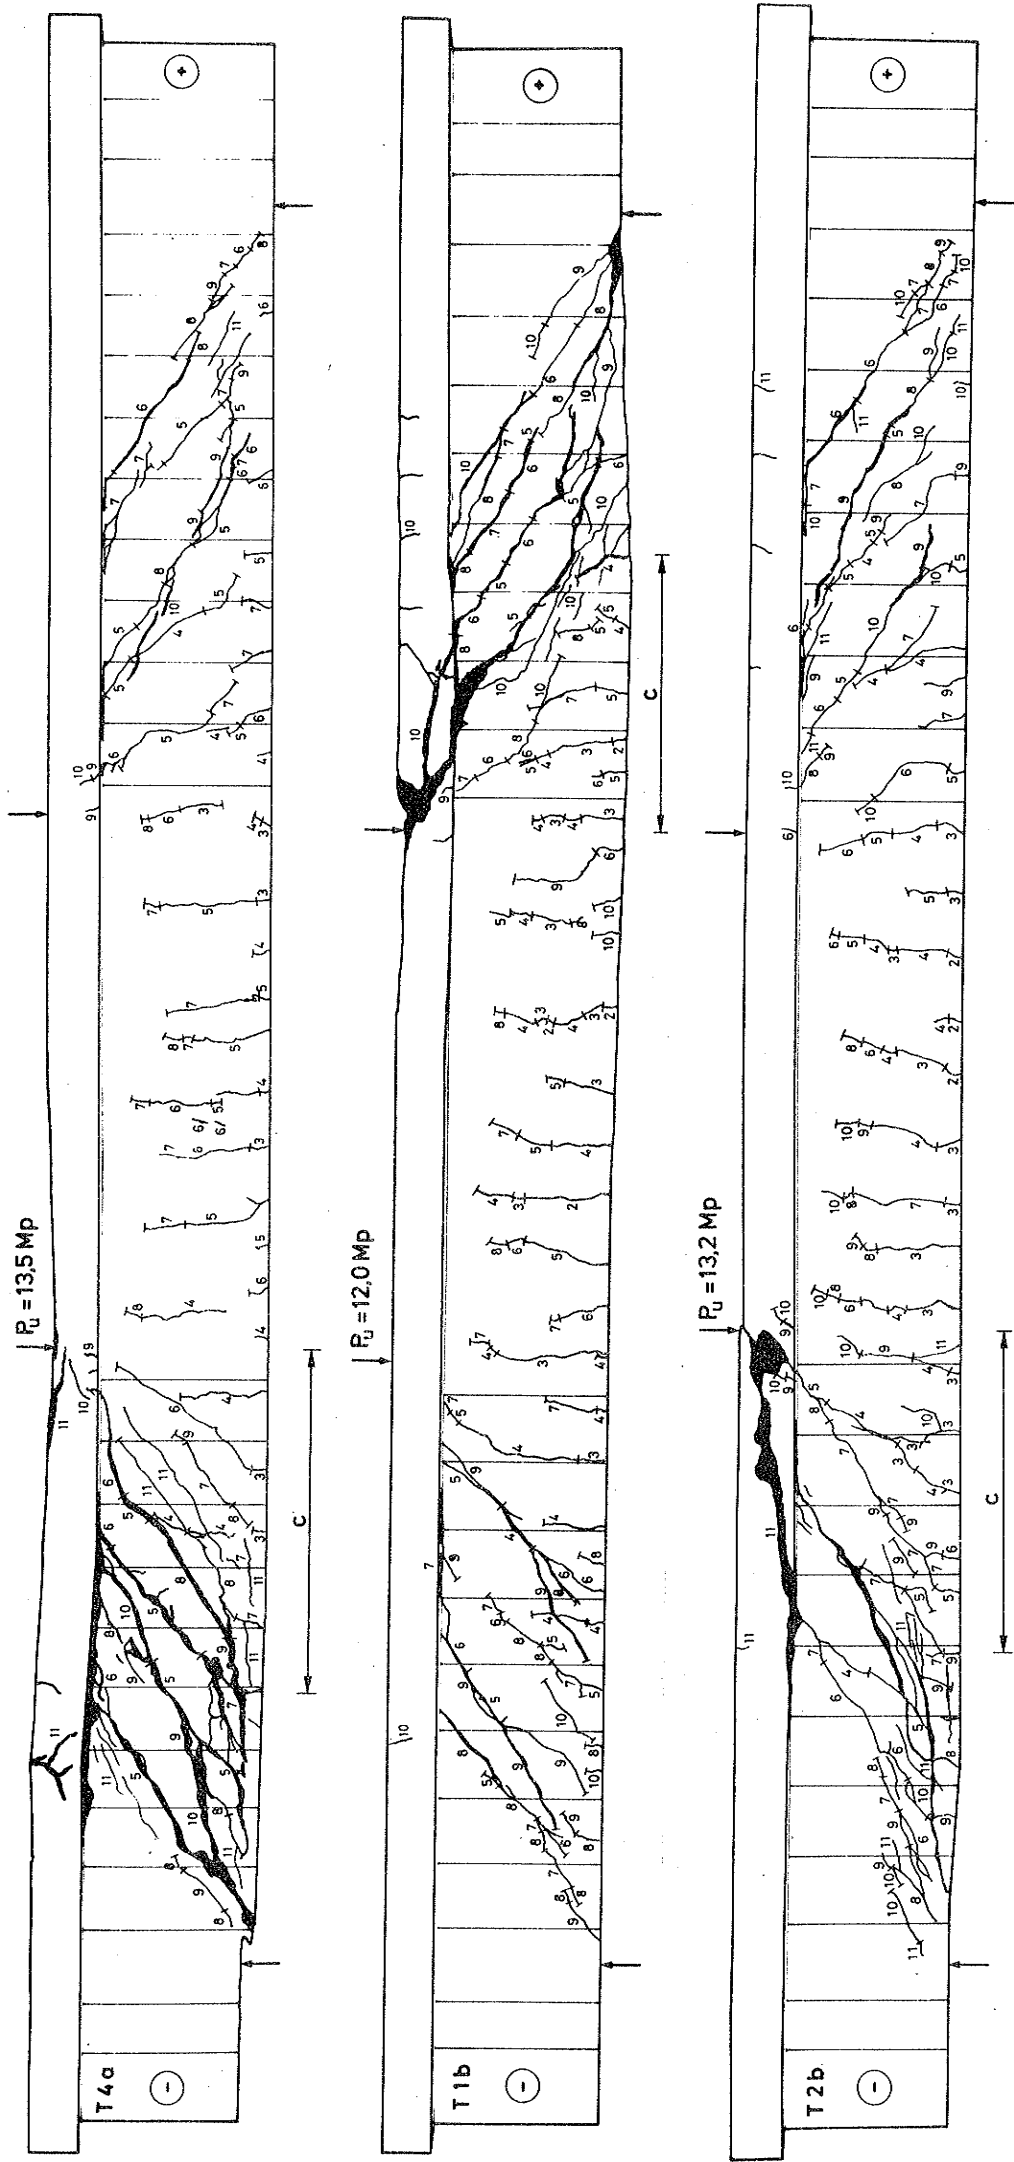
Crack pattern after failure, beam T4a, 1b, 2b
